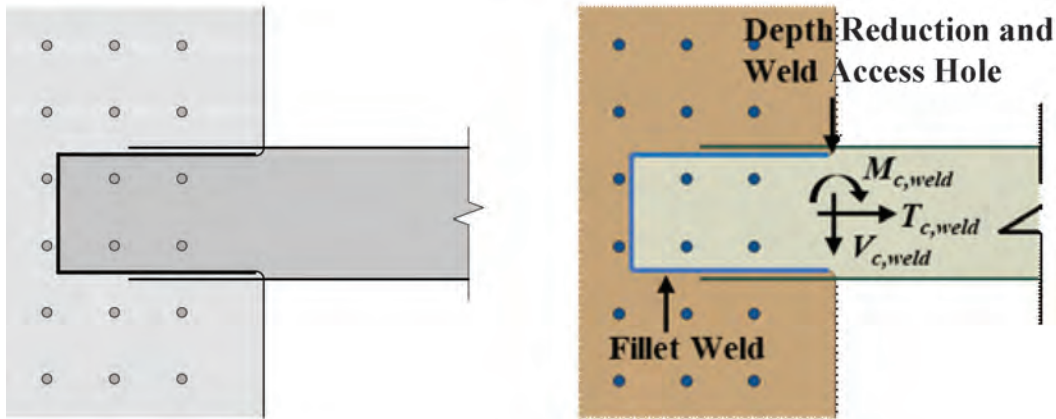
C-shaped fillet weld connecting beam web-to-wall web.
